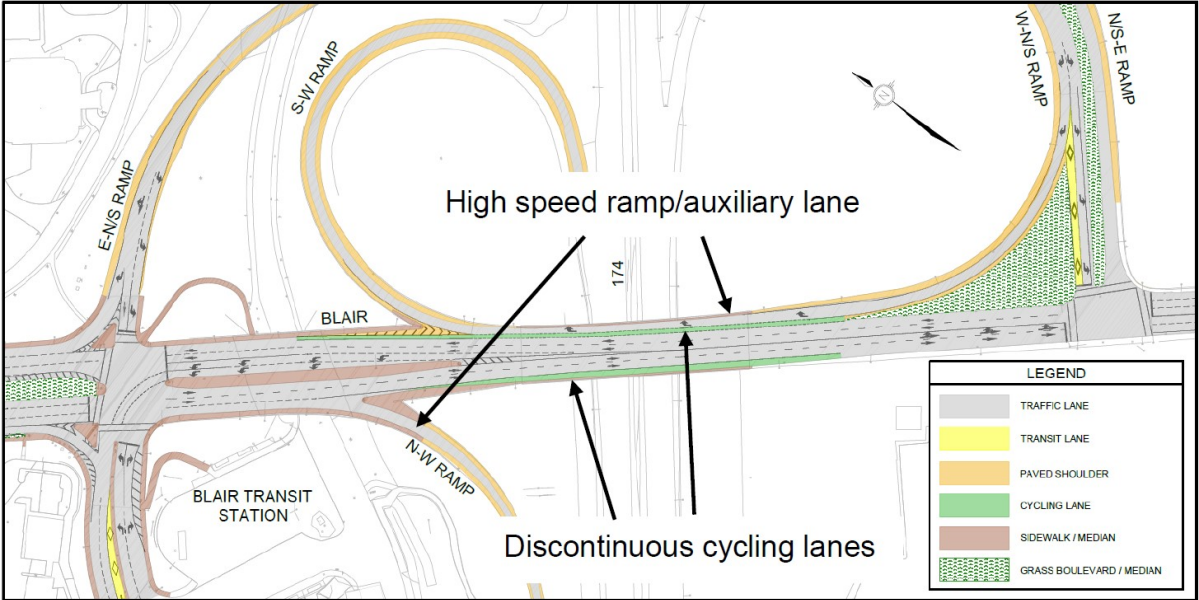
Existing Blair Road/OR174 Interchange Plan View
